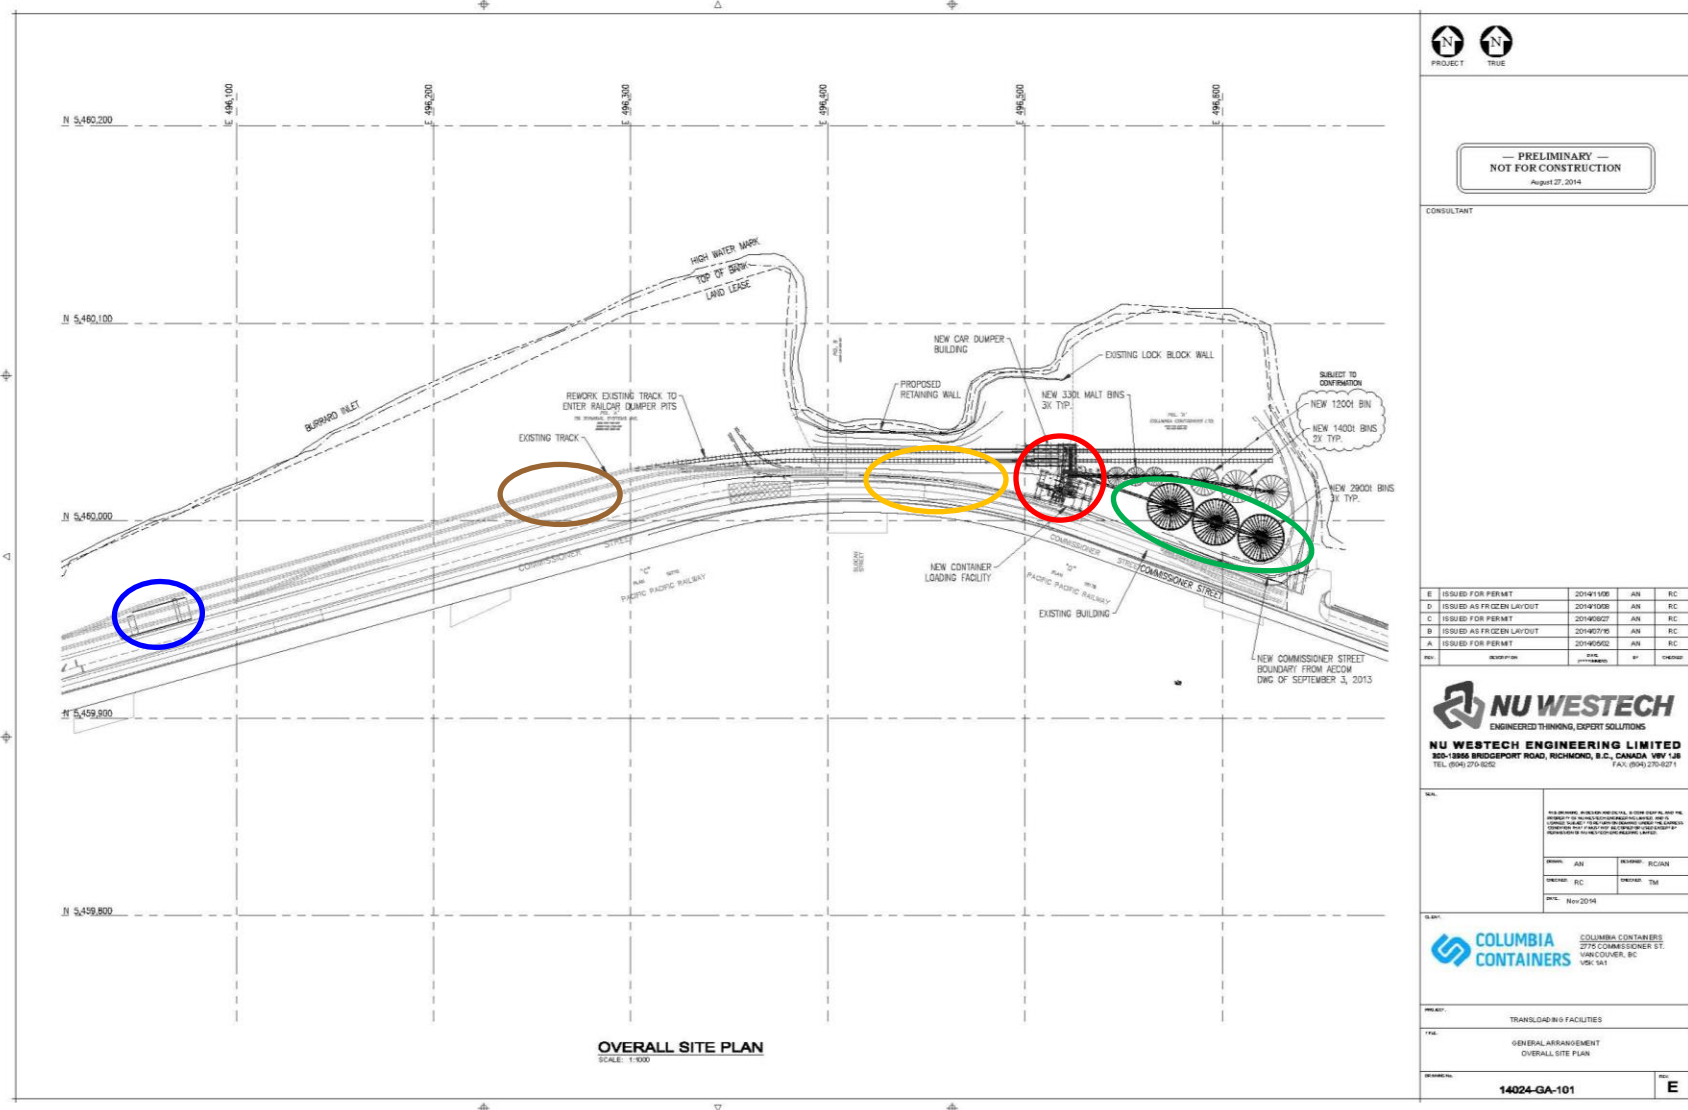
Proposed project layout and facilities locations with alternate configurations for the proposed system 1 and silos indicated (Nu Westech Engineering Ltd, 2014)
